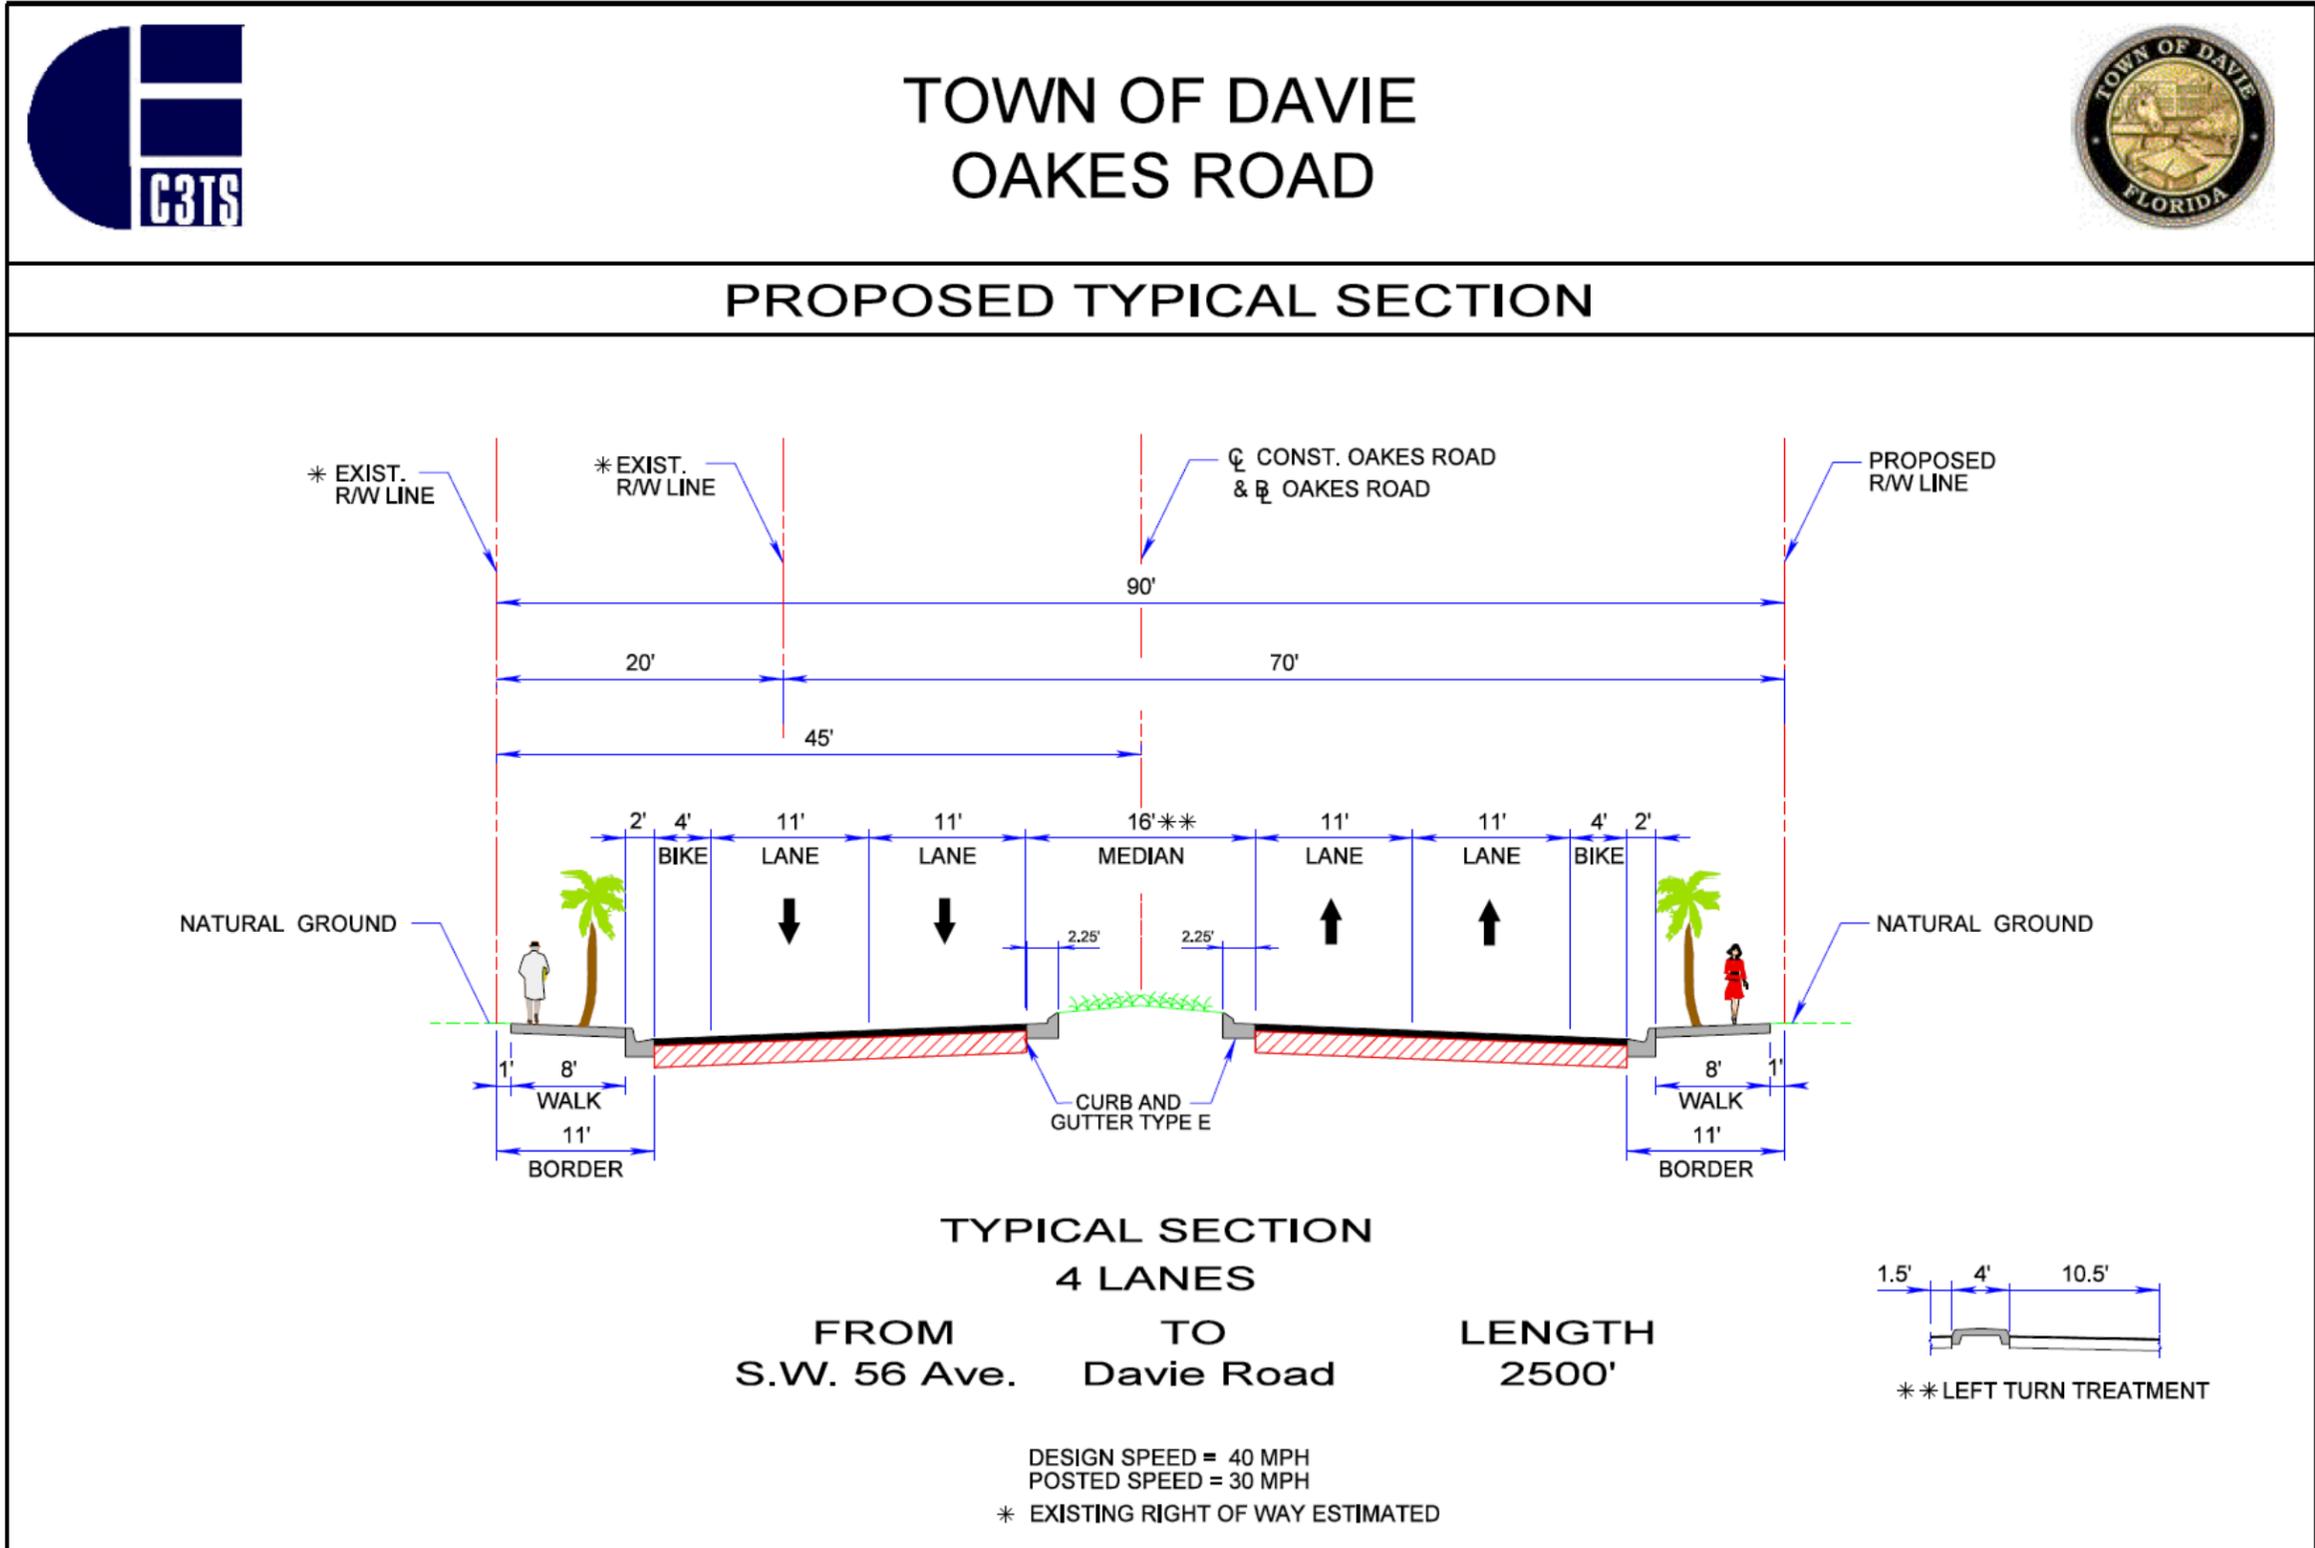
; Oakes Road Typical Section From SW 56 Ave To Davie Road
